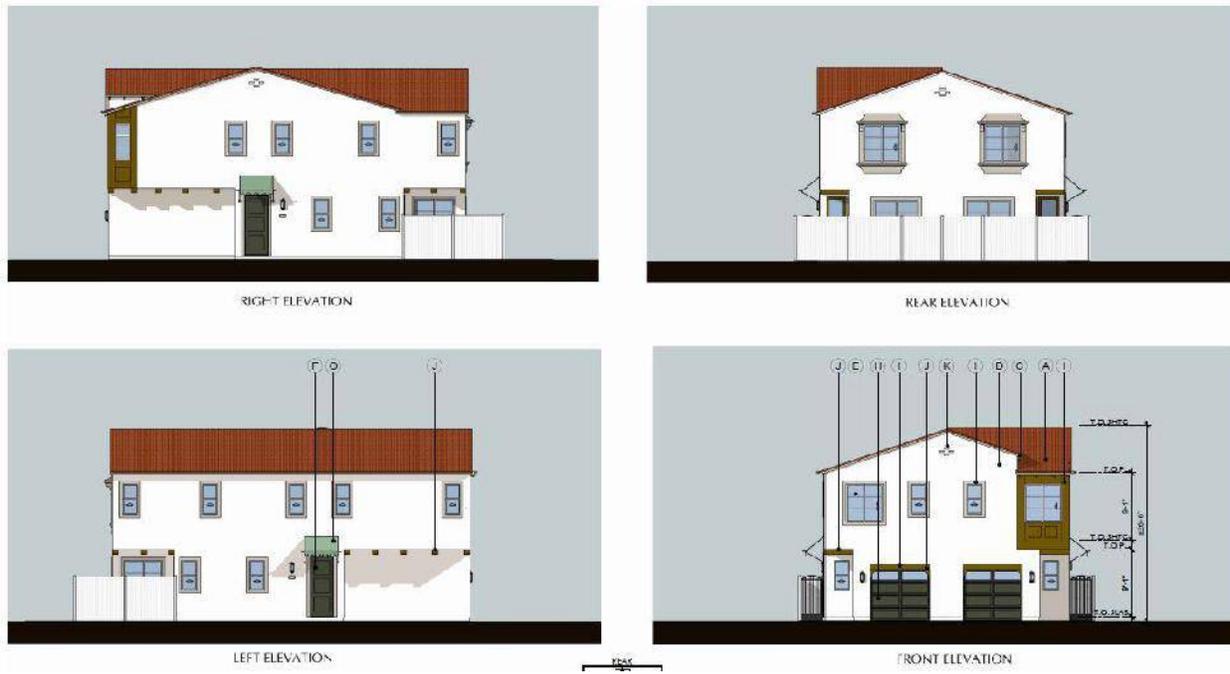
BUILDING ELEVATIONS APARTMENT 3A
